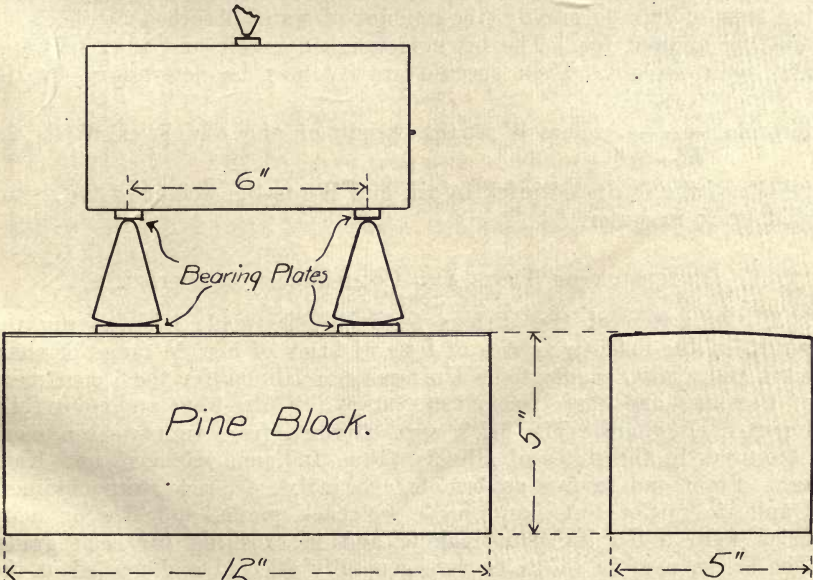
Arrangement for testing cross-breaking strength of brick.
